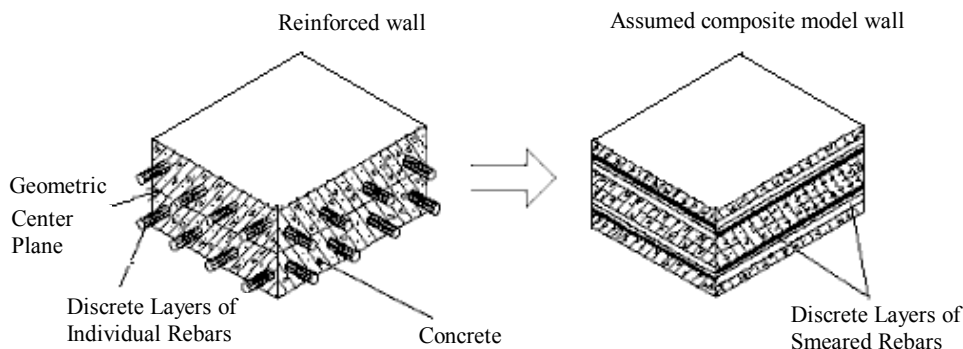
Section through wall/slab and equivalent finite element model with distinct layers of smeared reinforcing bars
